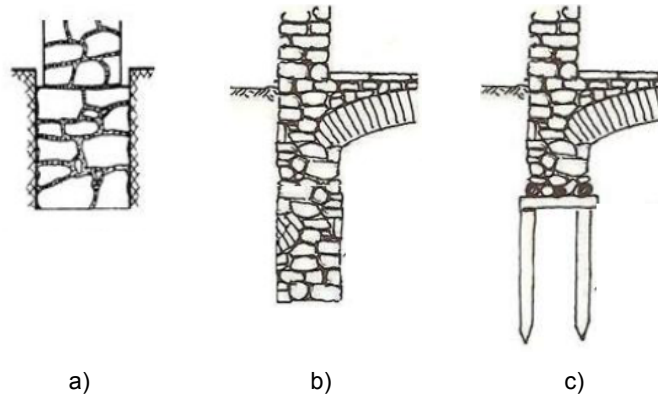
Foundation system (Carvalho, 2008): a) Direct foundation; b) Semi-direct foundation; c) Semi-direct foundation reinforced by timber piles.
